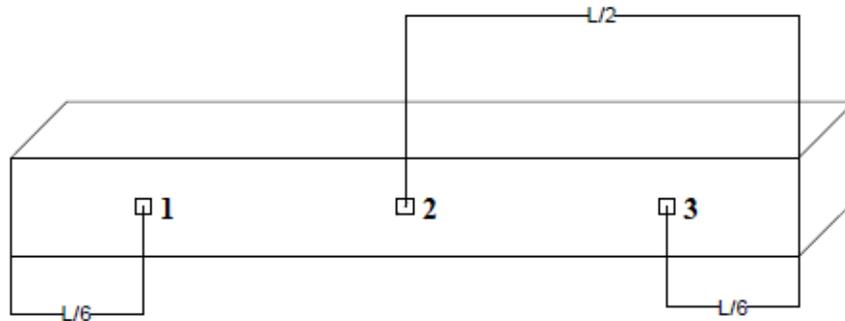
Arrangement of PZTs on Beam 1 (SSPC)
